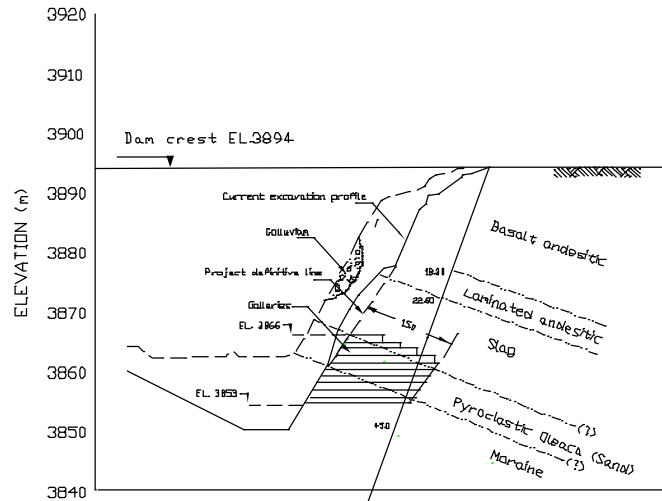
Salve Faccha dam: Final configuration of the superposed galleries
